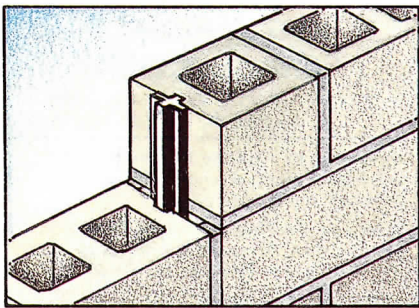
Hard rubber or PVC shear lugs transfer stresses at control joints for concrete block.
